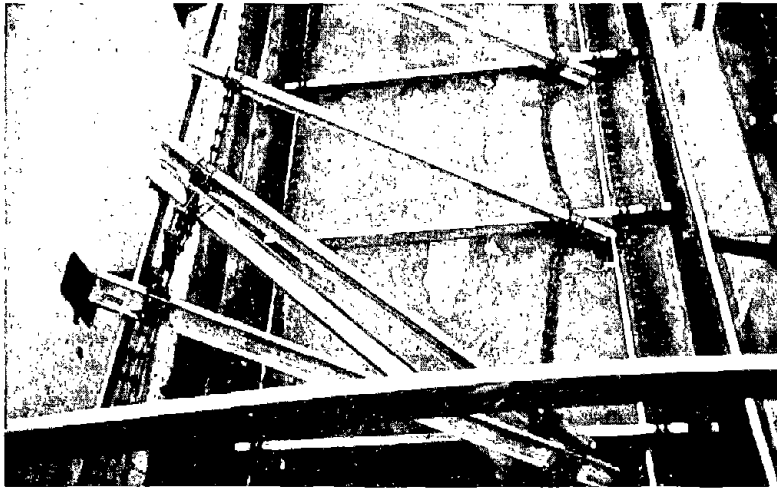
Damage to sludge scrapers at the sedimentation tanks.
